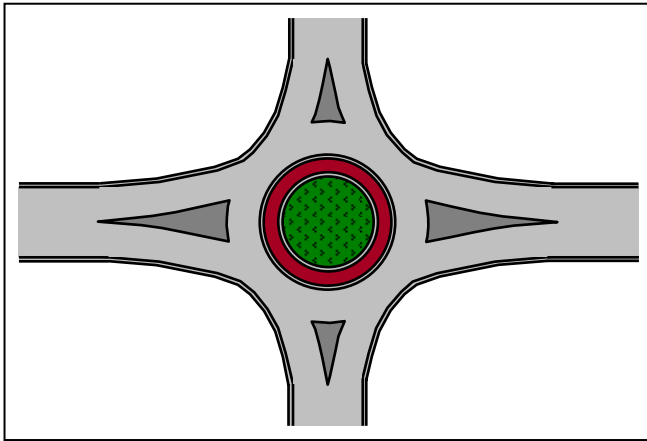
Joint Layout for Roundabout, “Pave-Through” Option
